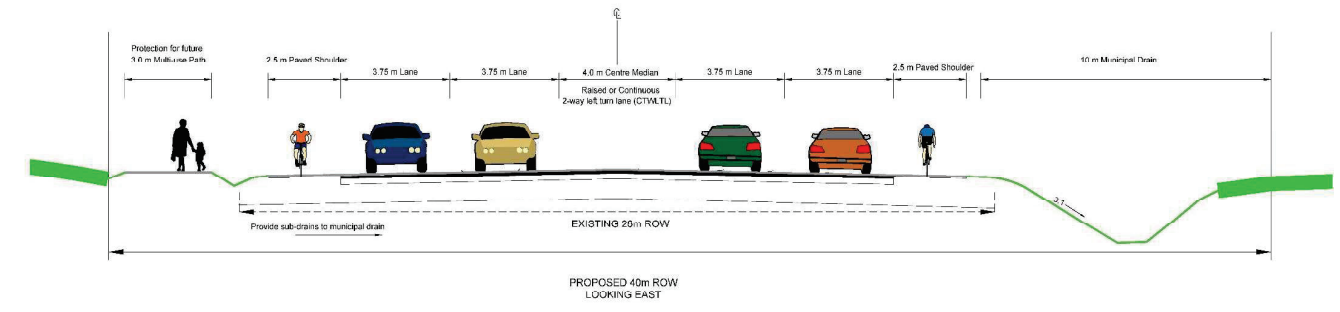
Section 3 Alternative 4 - 5-Lane Rural Cross Section
